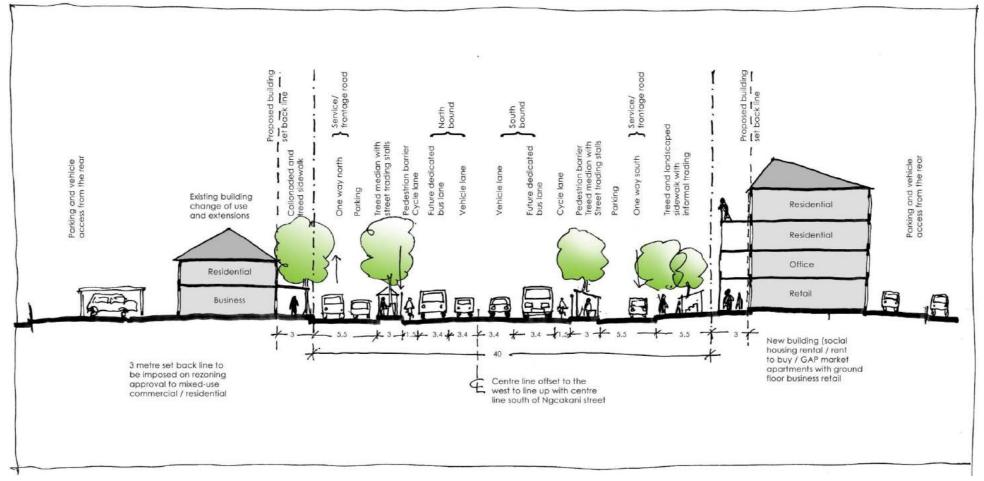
Street and sidewalk upgrading: Tarkastad, Tsolwana (EPWP)
